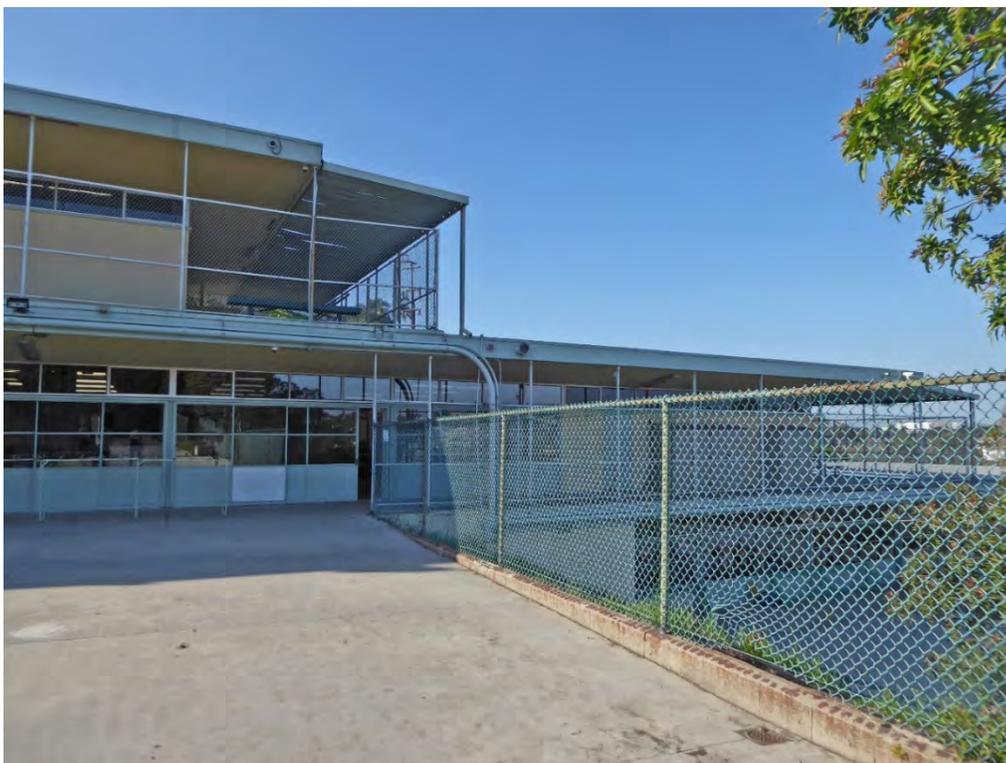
Ladera Classroom Building. southeast façade, view toward the northwest.
